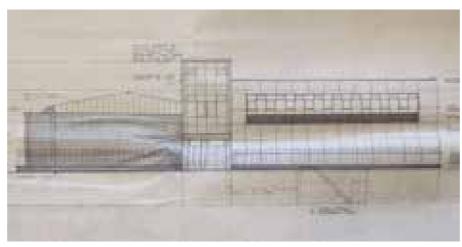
1958 Allied Bakeries scheme, Camden street elevation.
